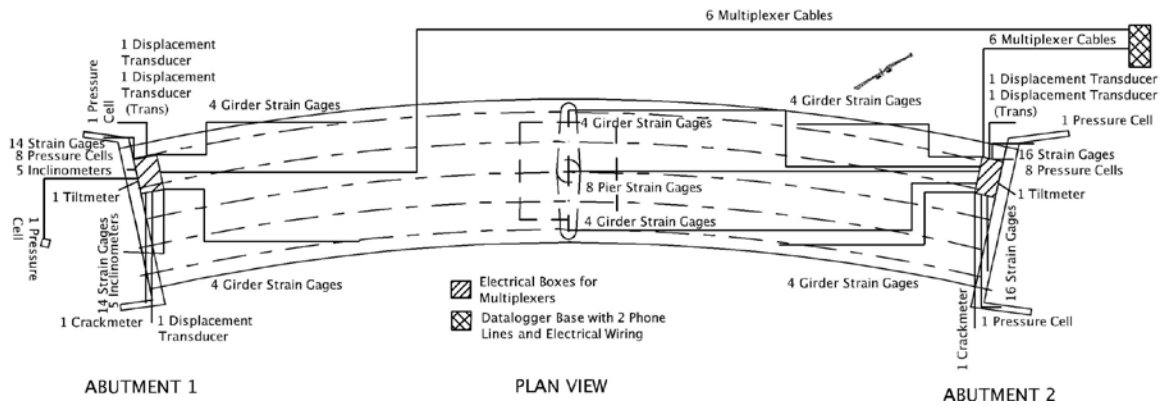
Overview of Instrumentation at Stockbridge Bridge
